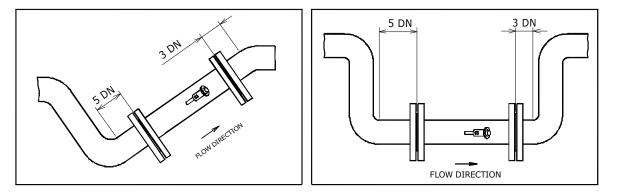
Placement proposalsto ensurea fully flooded sensor in the piping
